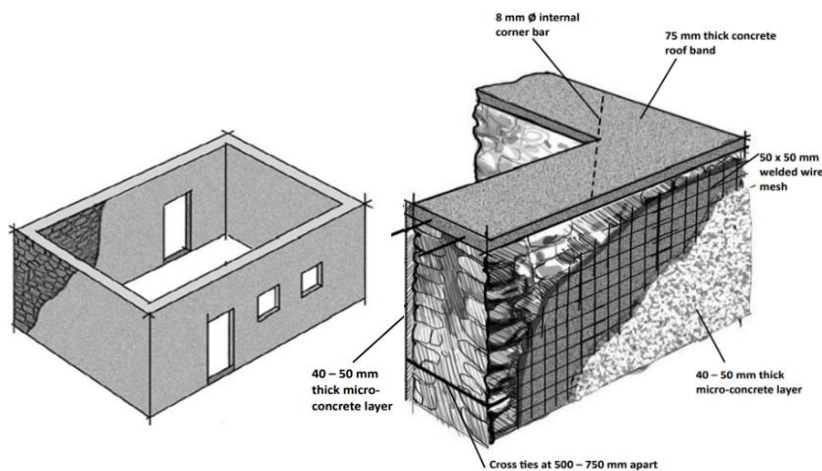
Jacketing Stone Masonry Walls (Bothara et al., 2004).
